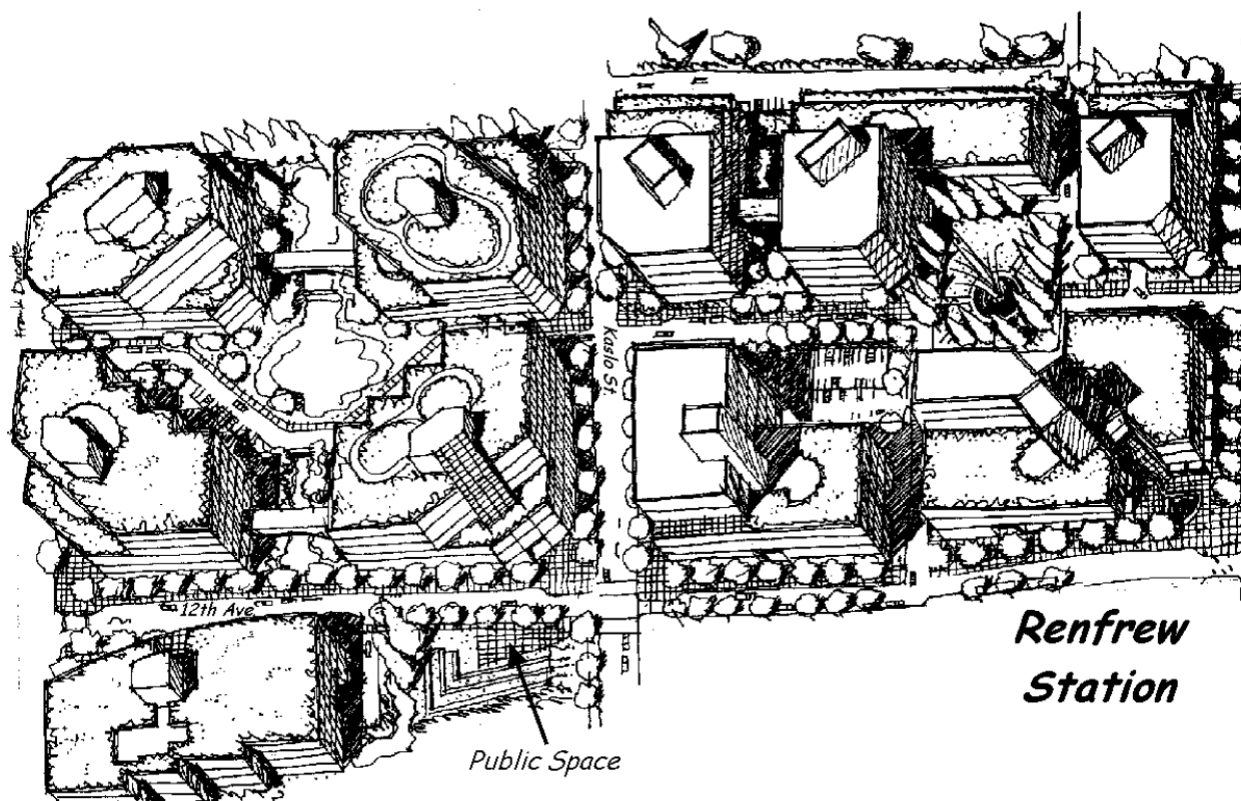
Redevelopment Concept Plan for Renfrew Station Precinct
